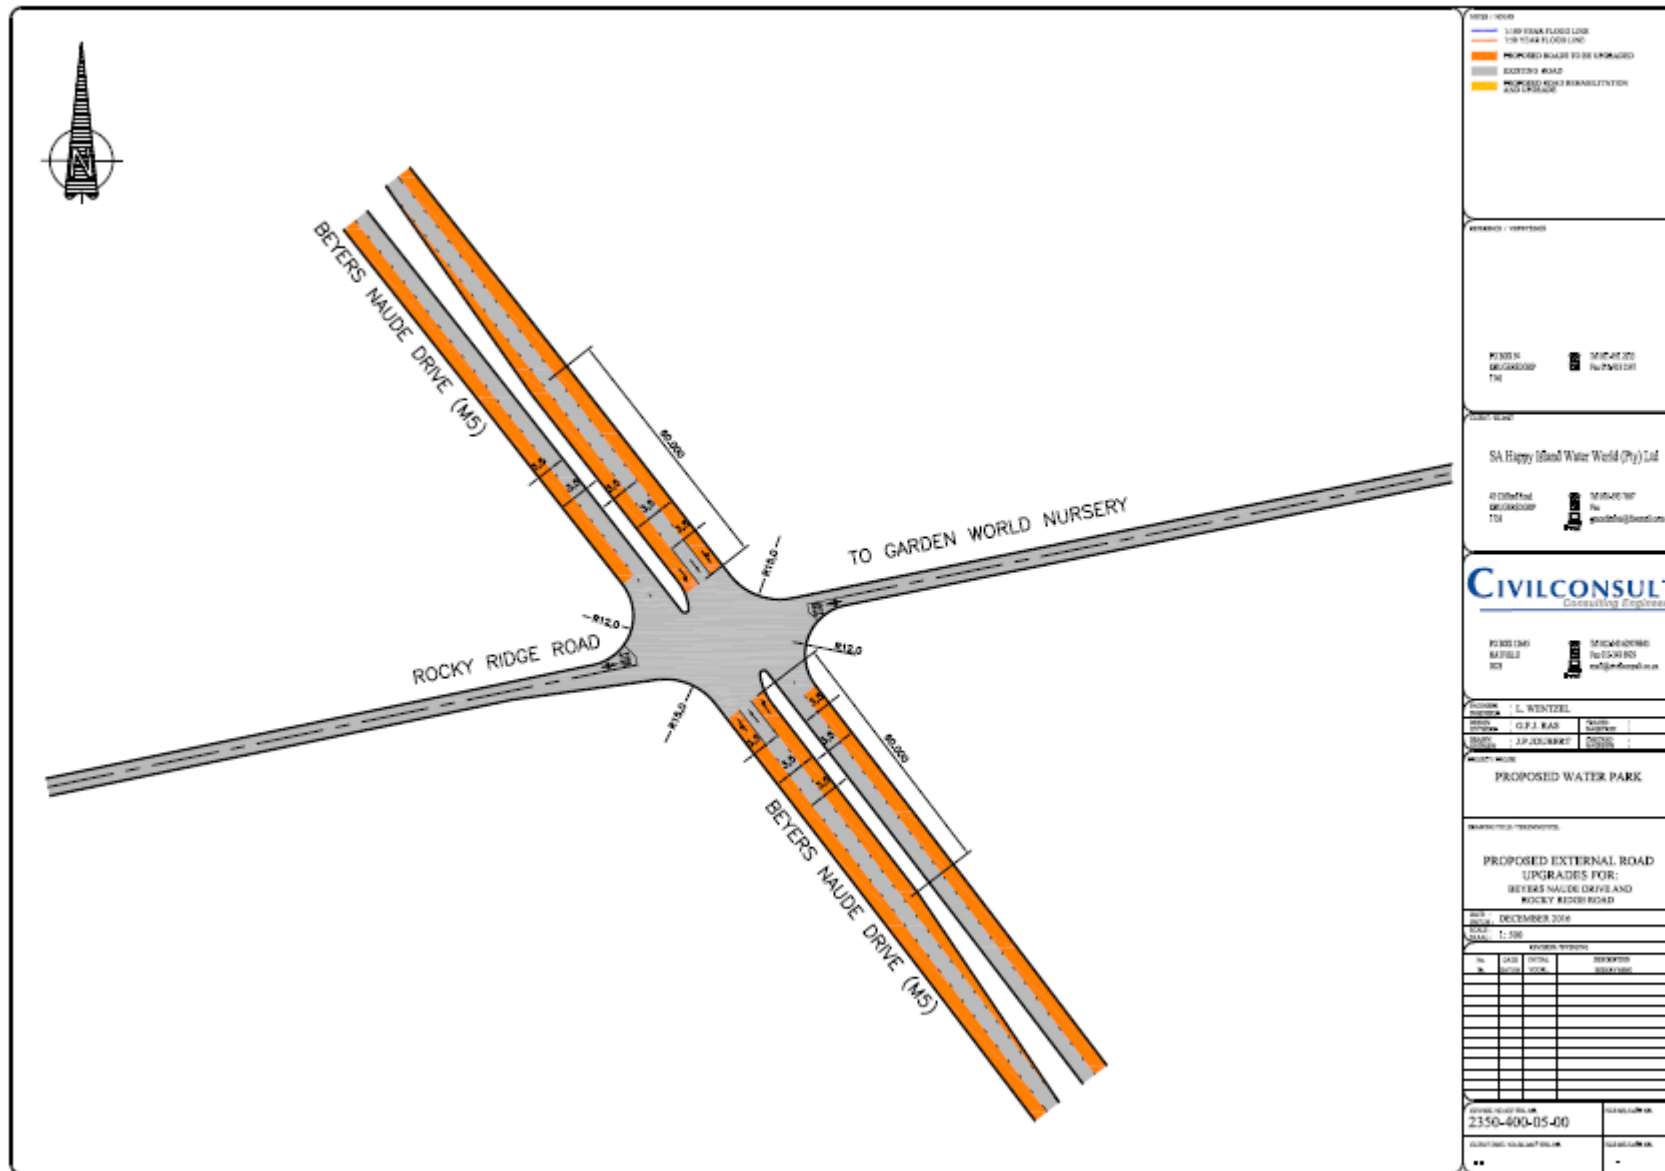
Proposed road rehabilitation and upgrades – Beyers Naude and Rocky Ridge Road
